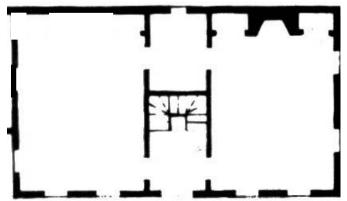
Center-Hall Entry Plan, modified to replicate 72R Dane
